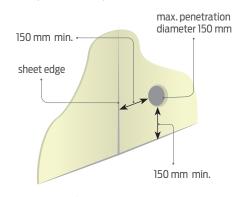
Manufacturer limits on larger penetrations in one plywood system.
